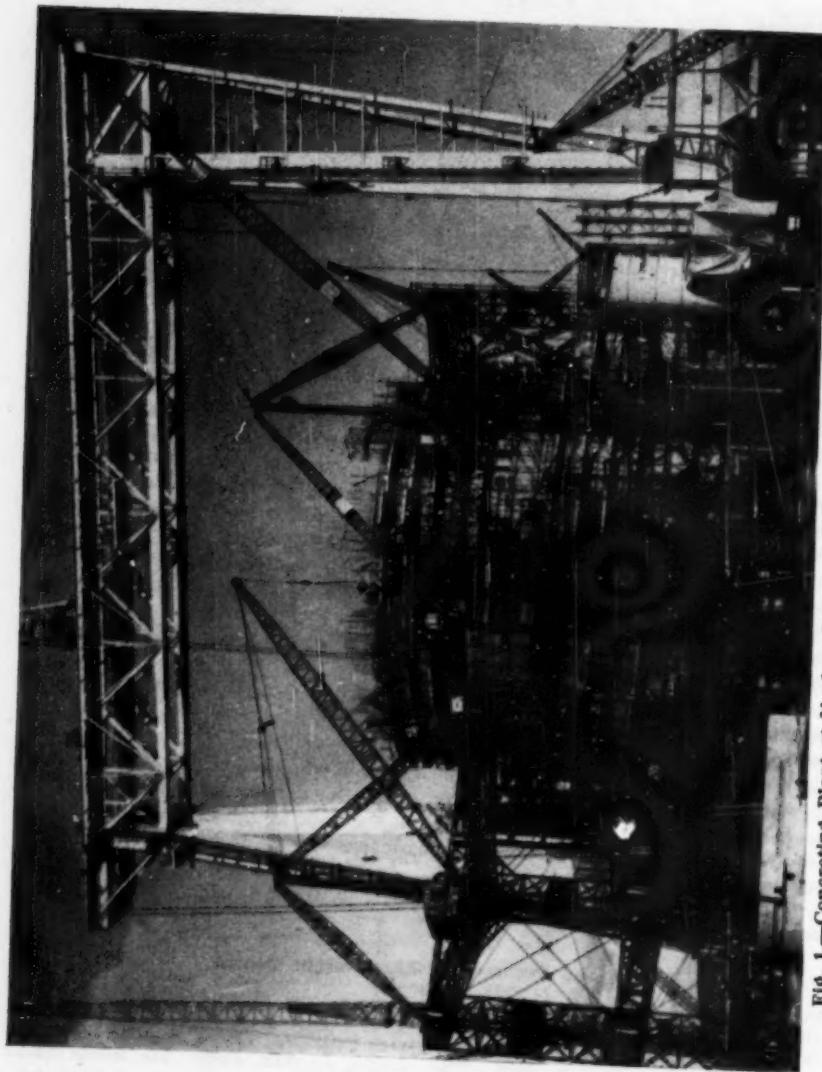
Concreting Plant at Nuclear Power Station: The Gantry Crane. (See page facing.)
